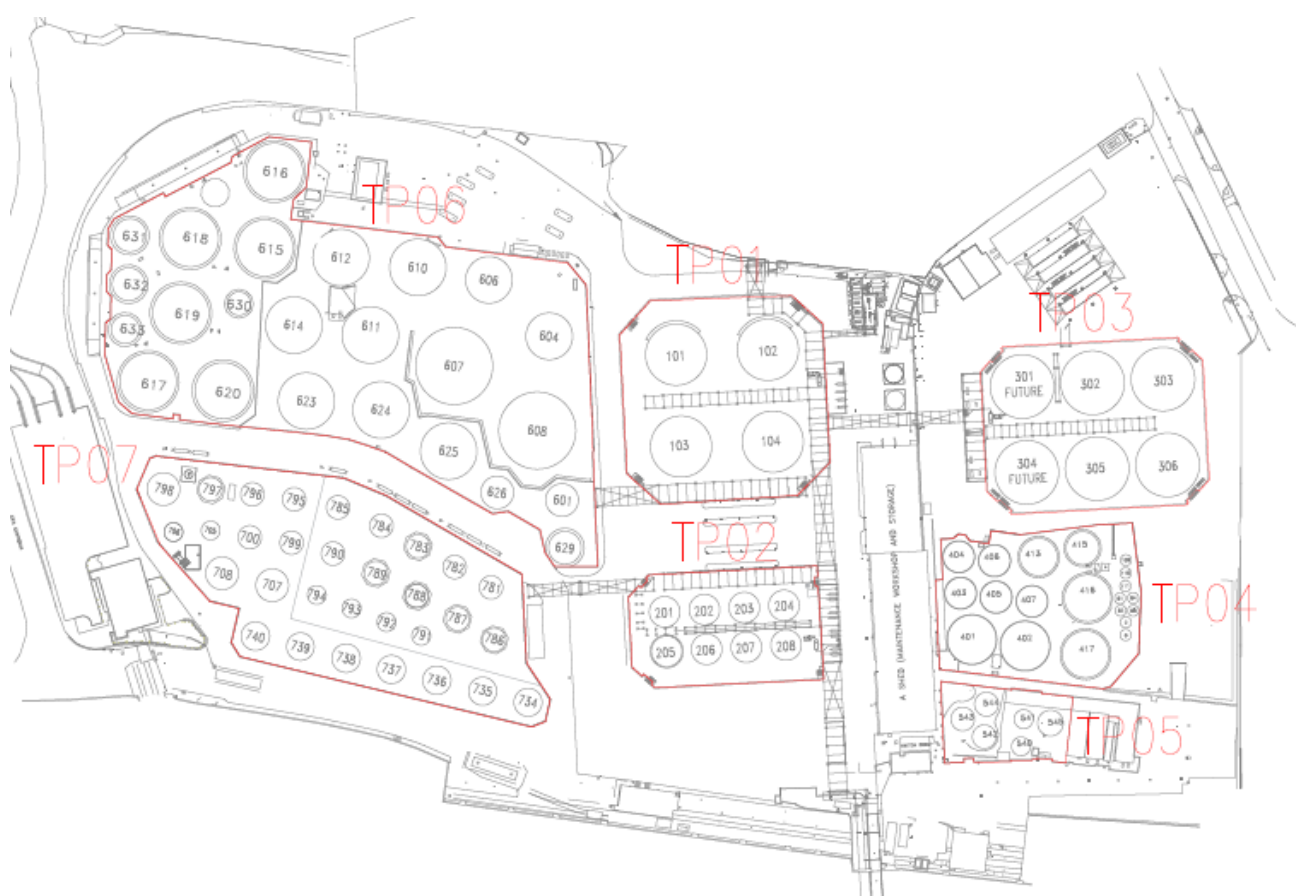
Site Operations Storage Plan (Northwest area of the facility)
